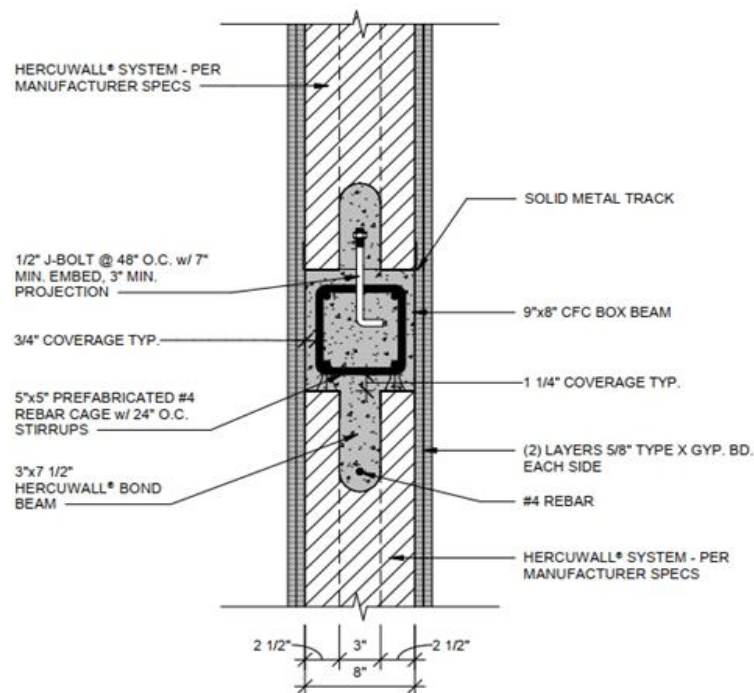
2-hr Load-Bearing Unbraced CFC Box Beam Wall
